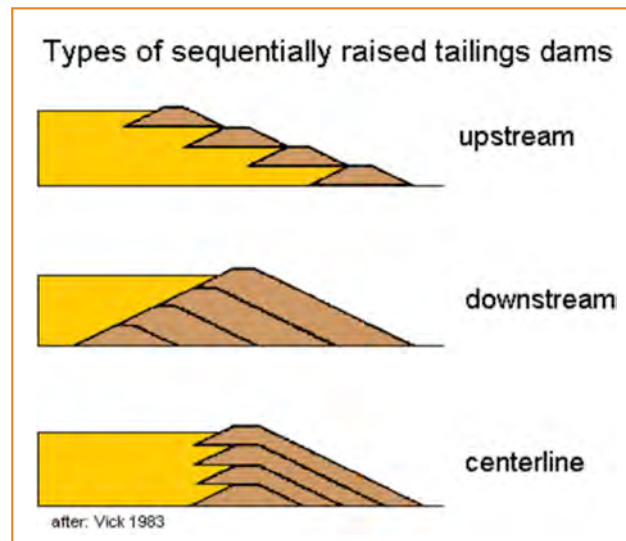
Tailings Dam Construction Types: (a) Upstream, (b) Downstream, (c) Centerline
